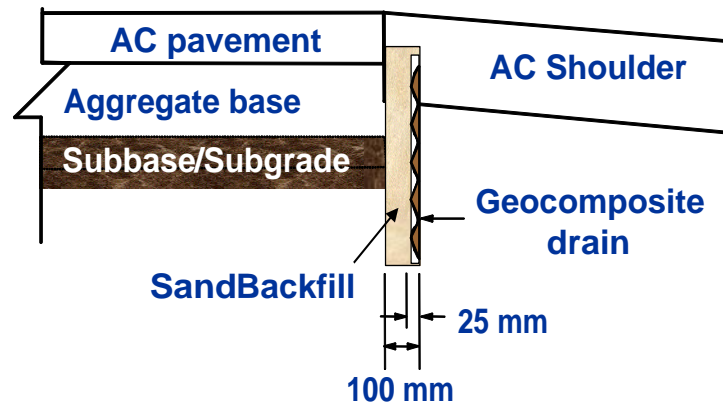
Typical AC pavement with geocomposite edgedrains (ERES, 1999).
